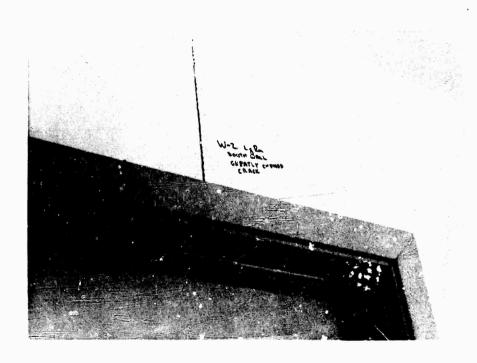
w-3, Old Crack Marked 5-20-65 Has Greatly Enlarged
